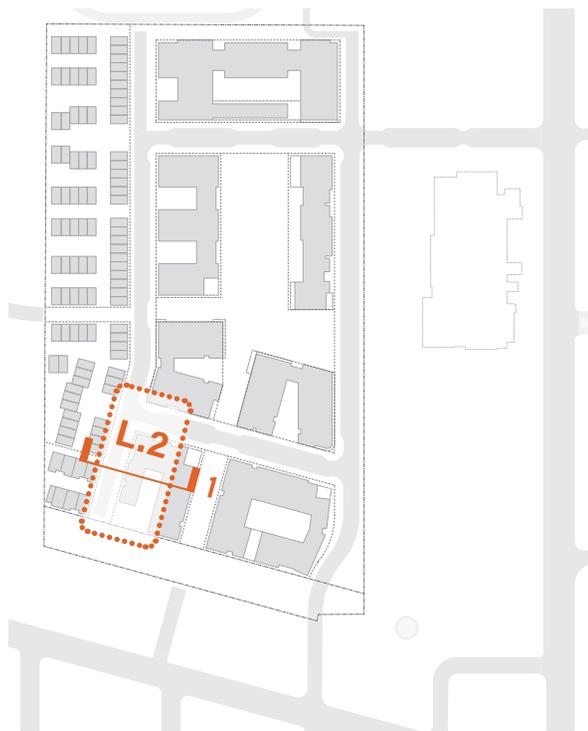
West Street North, Section 1 *see "Figure 5.15.3: West Street North, Plan Enlargement", Site Plan L.1
